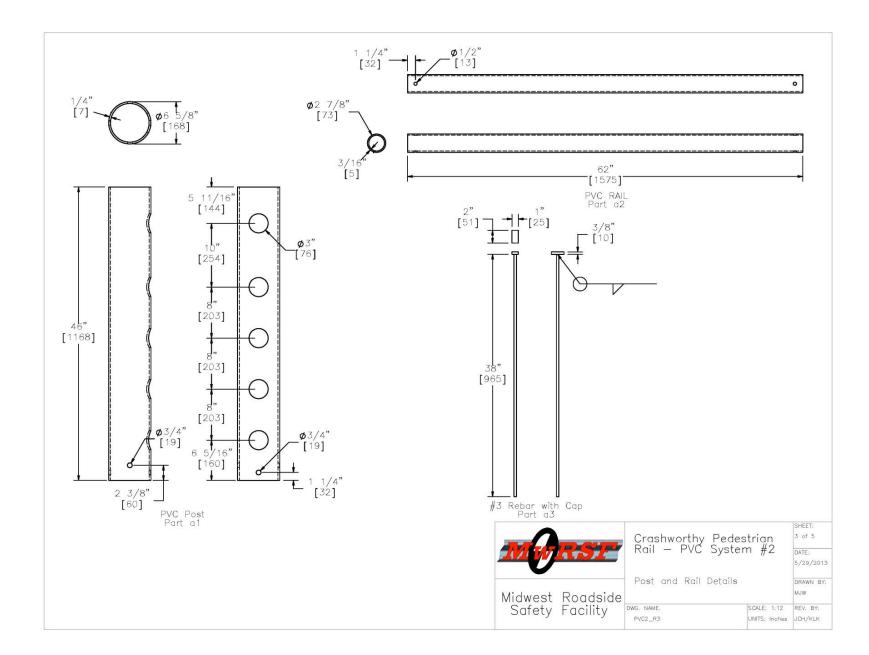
Modular PVC Rail, Design Concept PVC2-a
